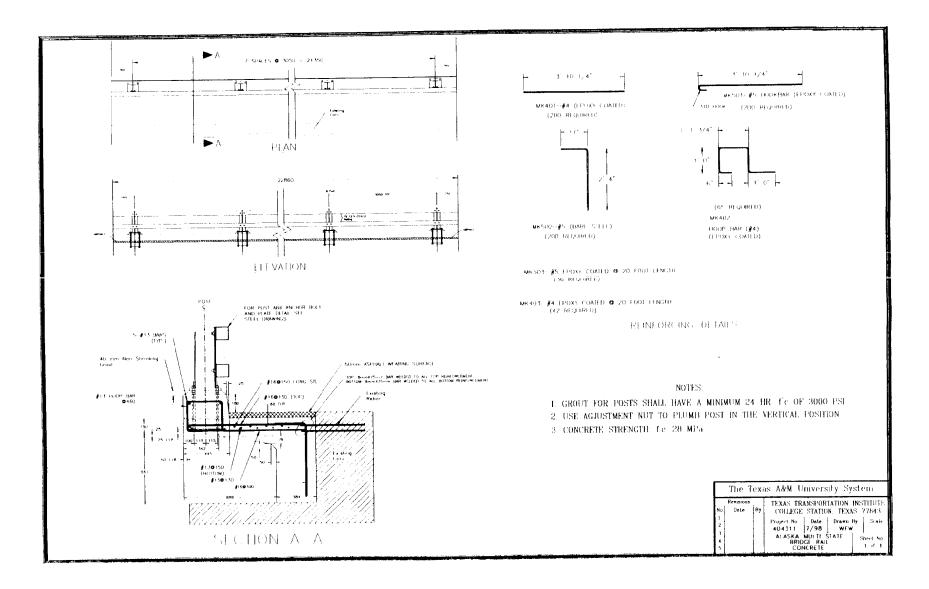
Details of the Alaska Multi-State Bridge Railing mounted on the curb (concrete).
